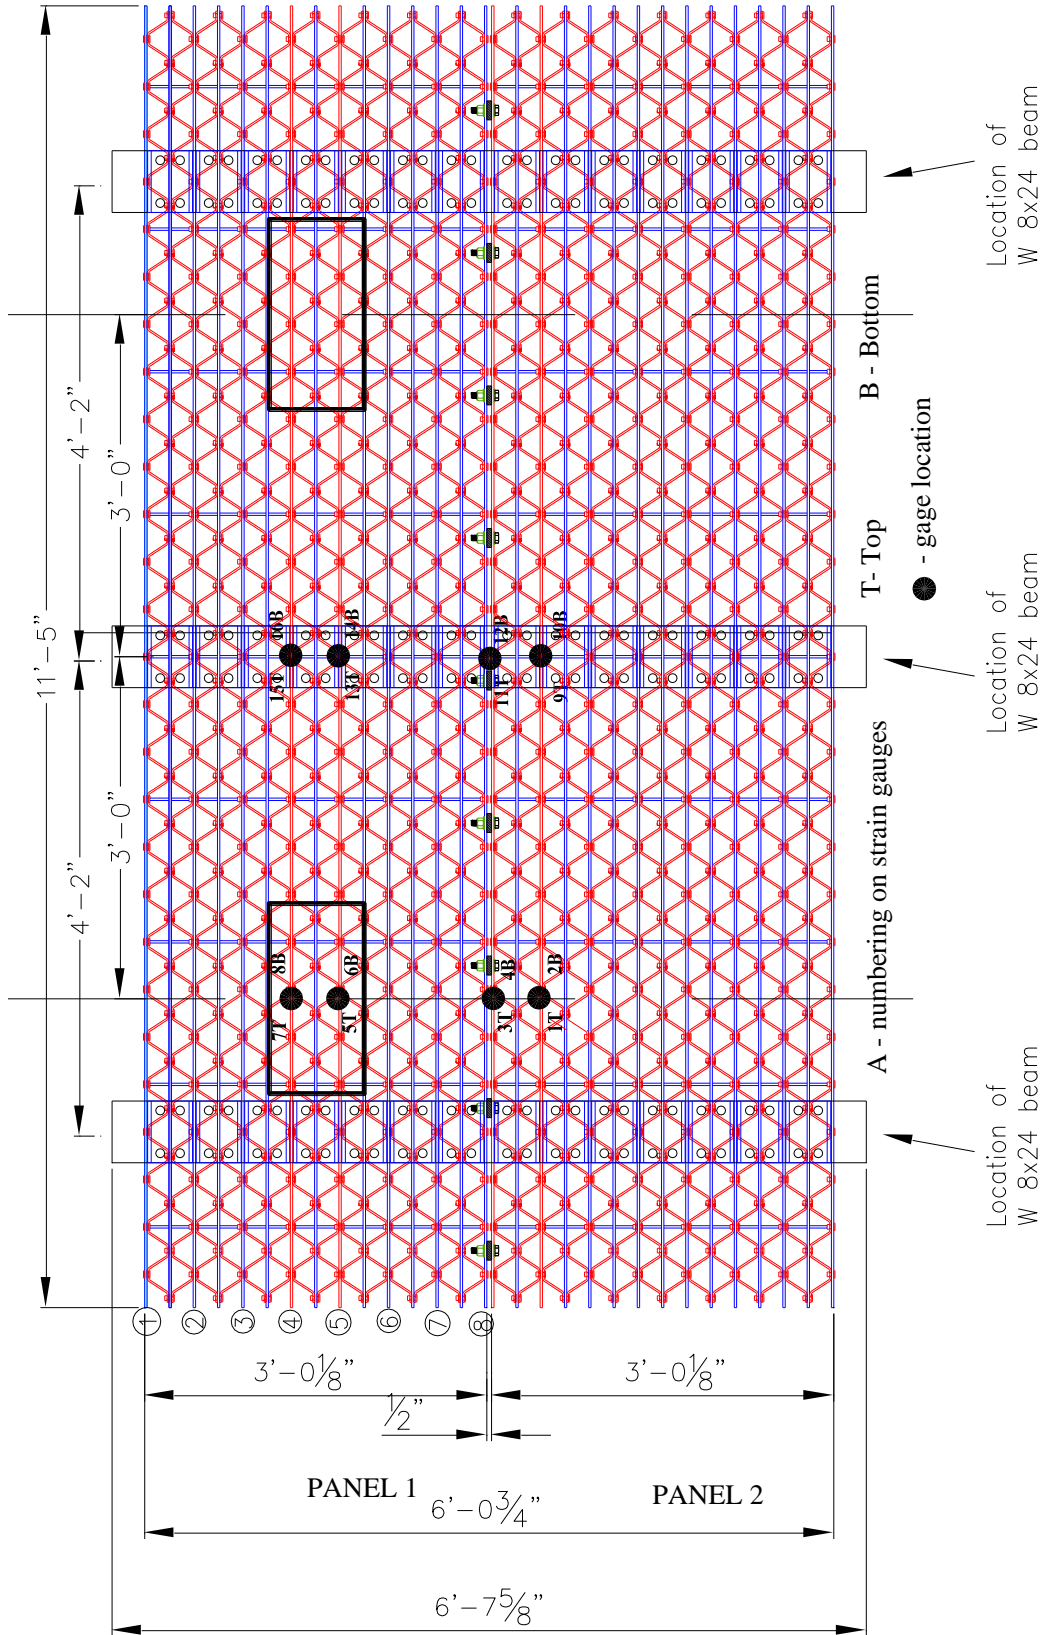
General Arrangement of 37R5-A1 with gage and load positions for test #1 and #3
